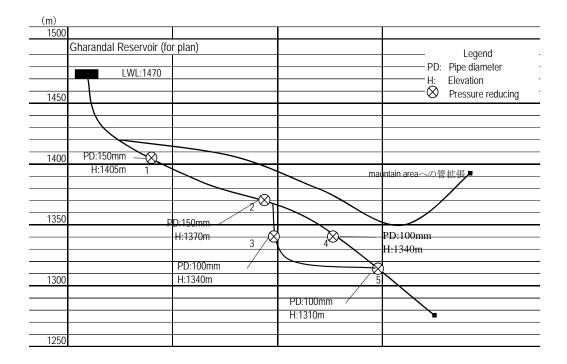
Location of Pressure Reducing Valve (Gharandal)
